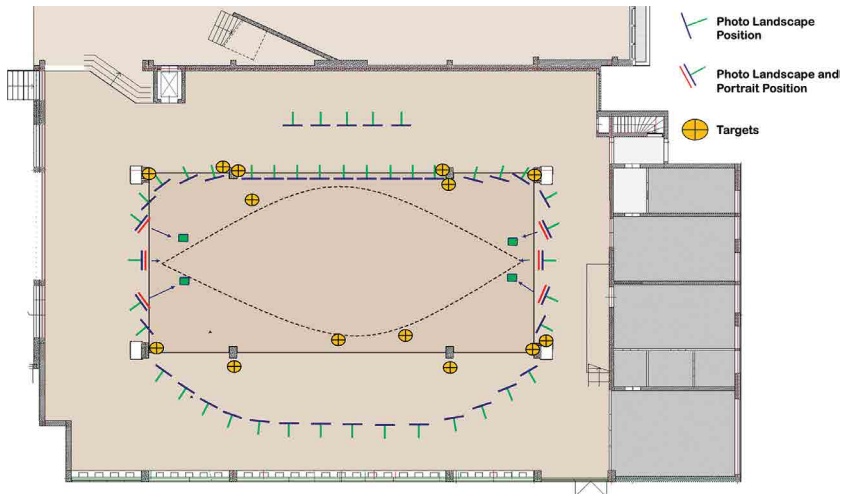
Bremen Cog floor plan, common coordinate system on the ground floor.
